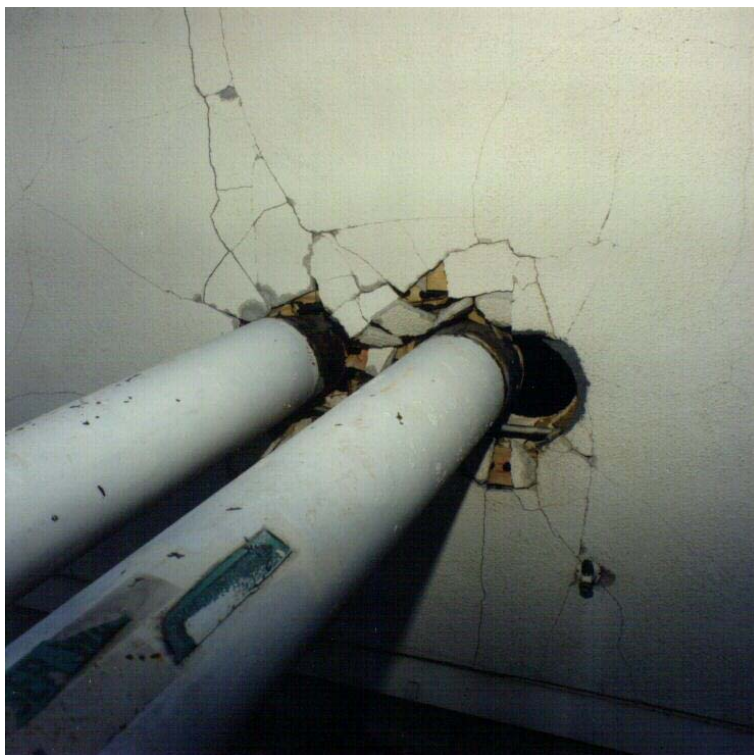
Damage to piping, stud wall and finishes due to movement of poorly restrained floor-mounted piping in the 1994 magnitude-6.7 Northridge Earthquake (Photo courtesy of Mason Industries).
